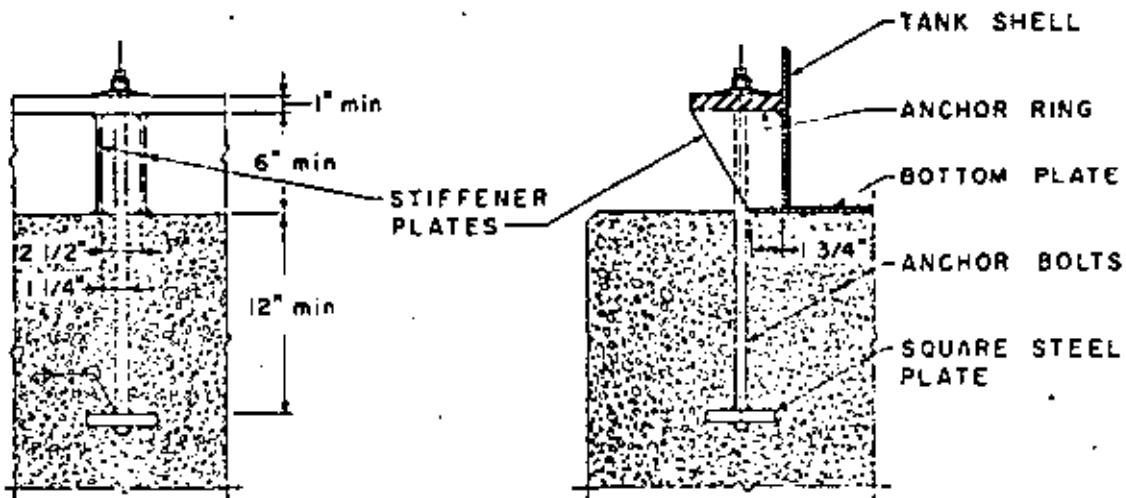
ANCHORED TANKS--RECOMMENDED DETAILS FOR IMPROVEMENT OF ANCHORAGE [40]
